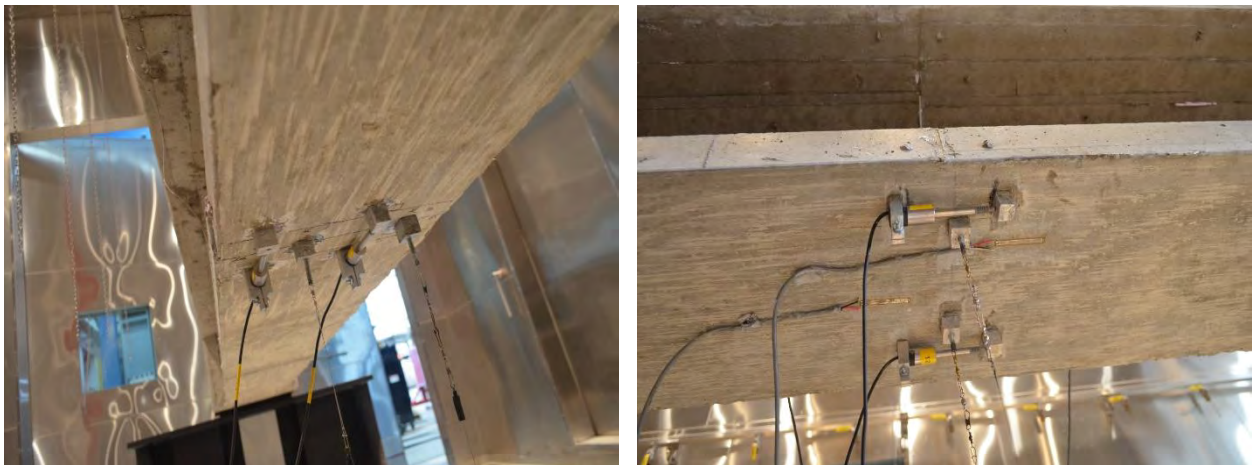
LMTs, LVDTs, and strain gages on the soffit of the beam at mid-span
